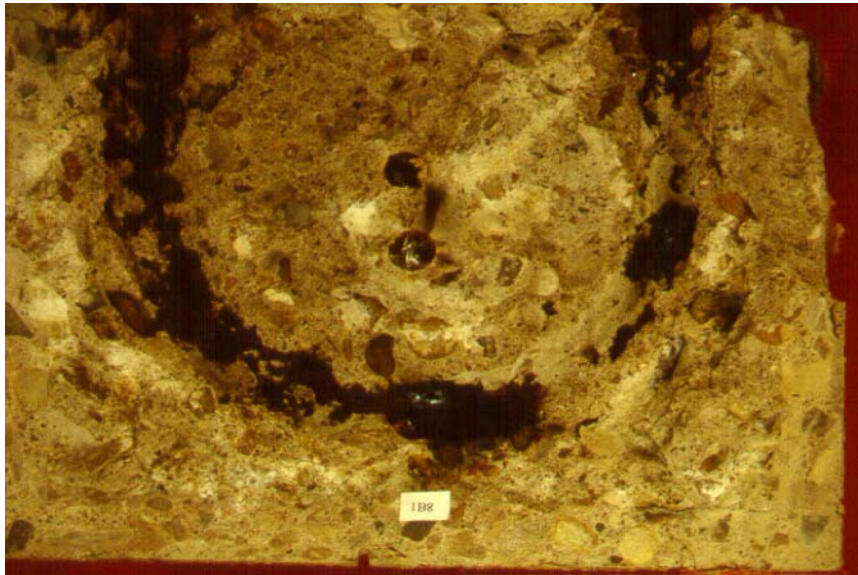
Damage on Concrete for Bent Black Bar (1B8).
